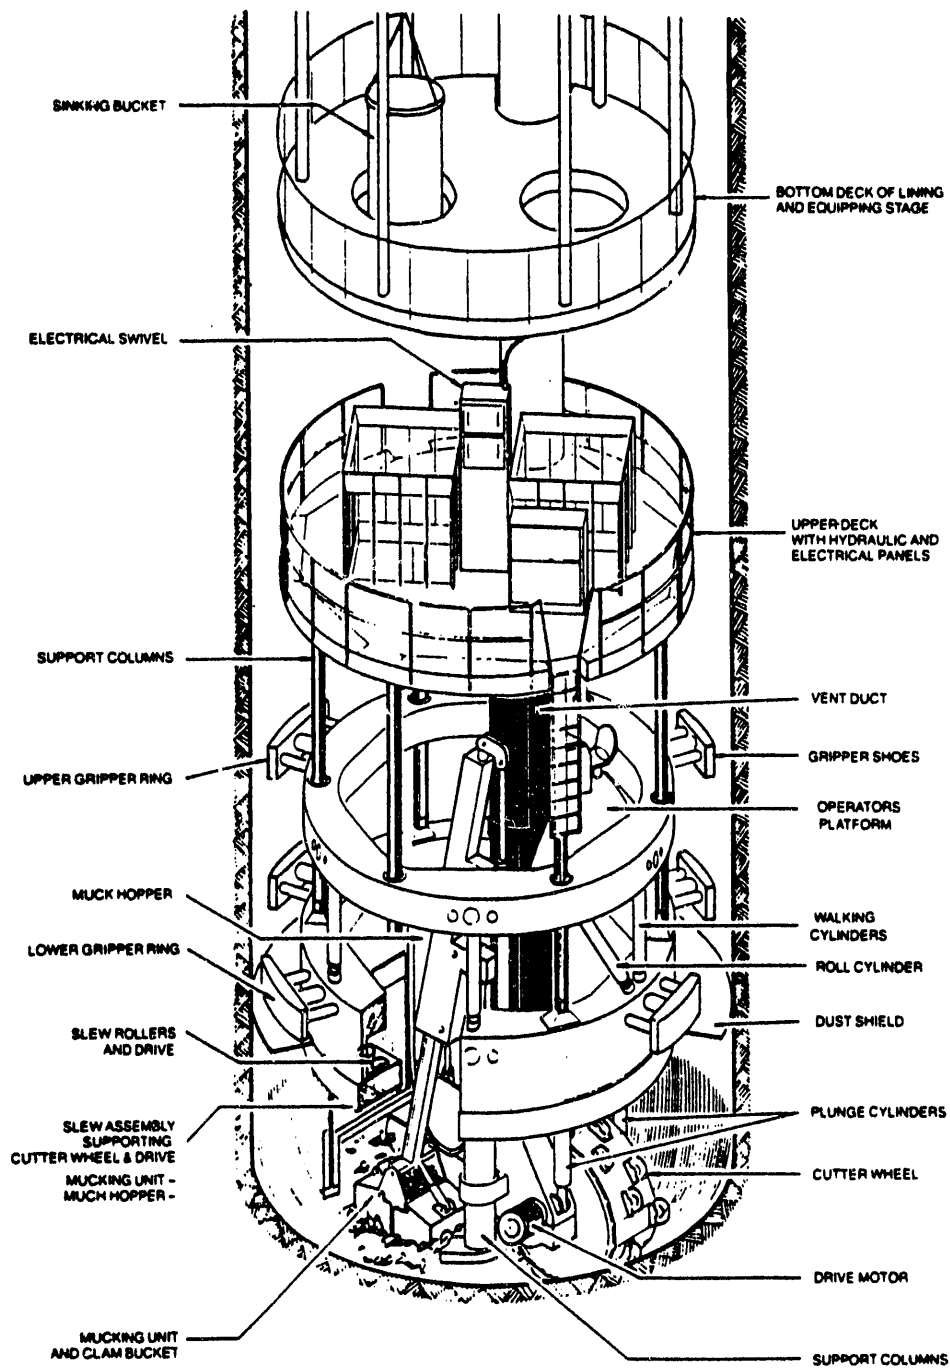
Schematic Drawing of a Vertical Wheel Shaft Boring Machine (SBM)
